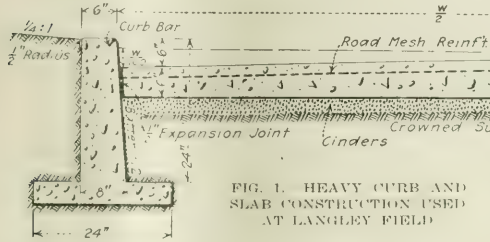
HEAVY CURB AND SLAB CONSTRUCTION USED AT LANGLEY FIELD
